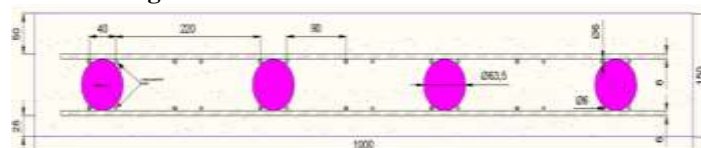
Plan of an arrangement of reinforcement and HDPE ball uniformly.
